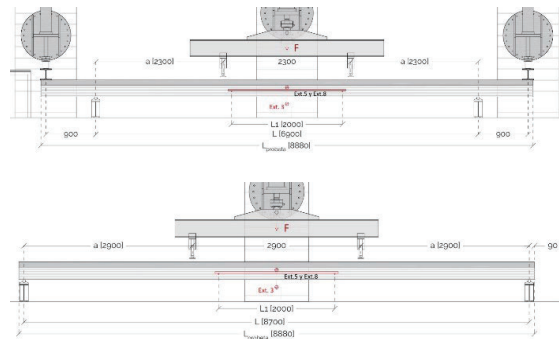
Type A and type B arrangements for the short-term tests made after long-term tests.
